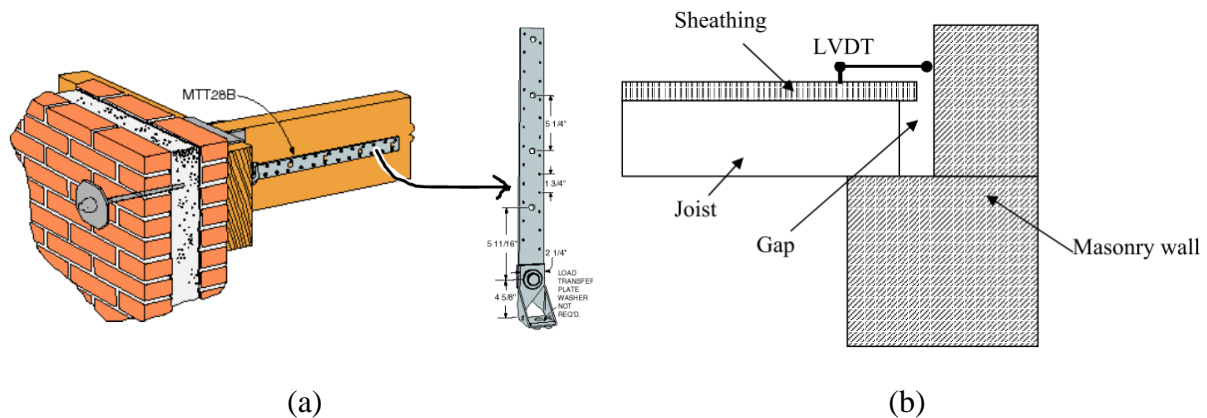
Joist masonry wall connections details, from Yi [99]: metal tie connections (a) and masonry pocket connections (b).
